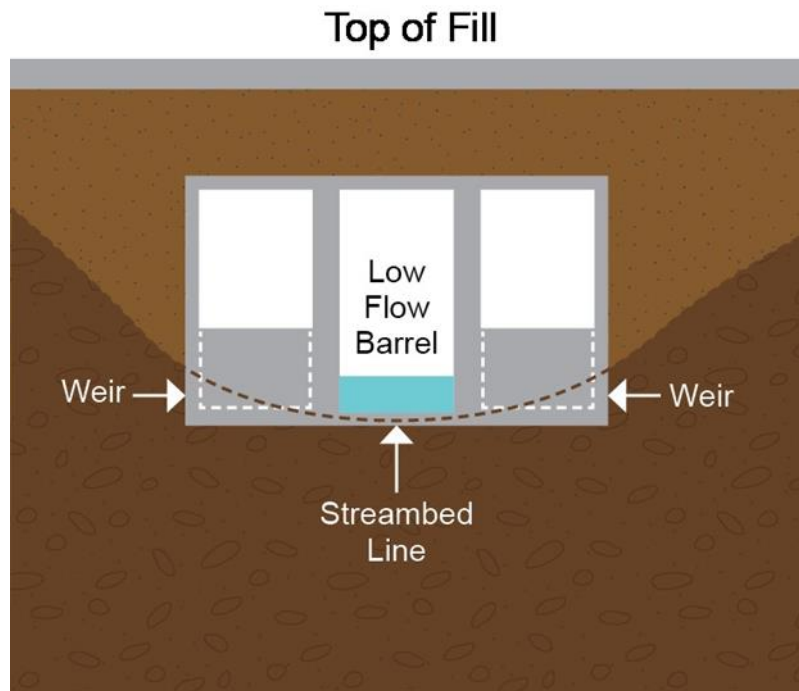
Multiple barrel culverts with one low flow barrel.
